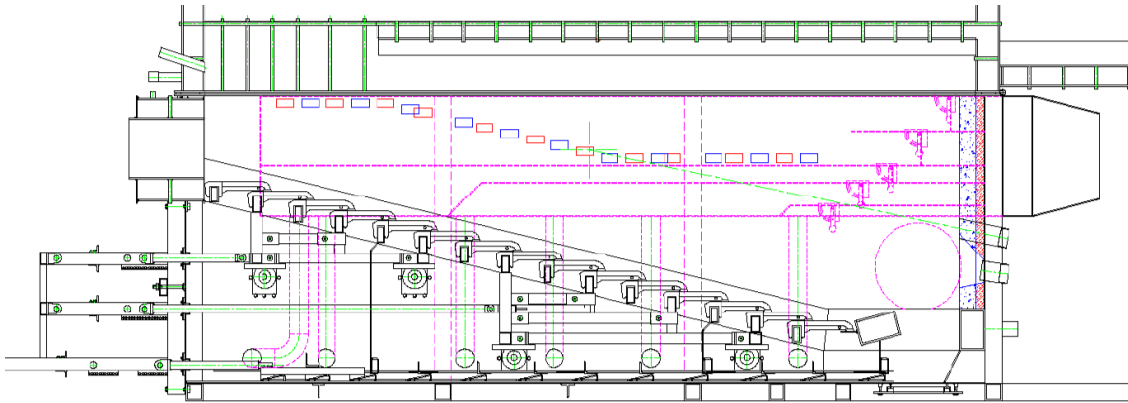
Drawing of furnace of Hinnerup Fjernvarmeværk wood chip fired district heat boiler (5 MW).
